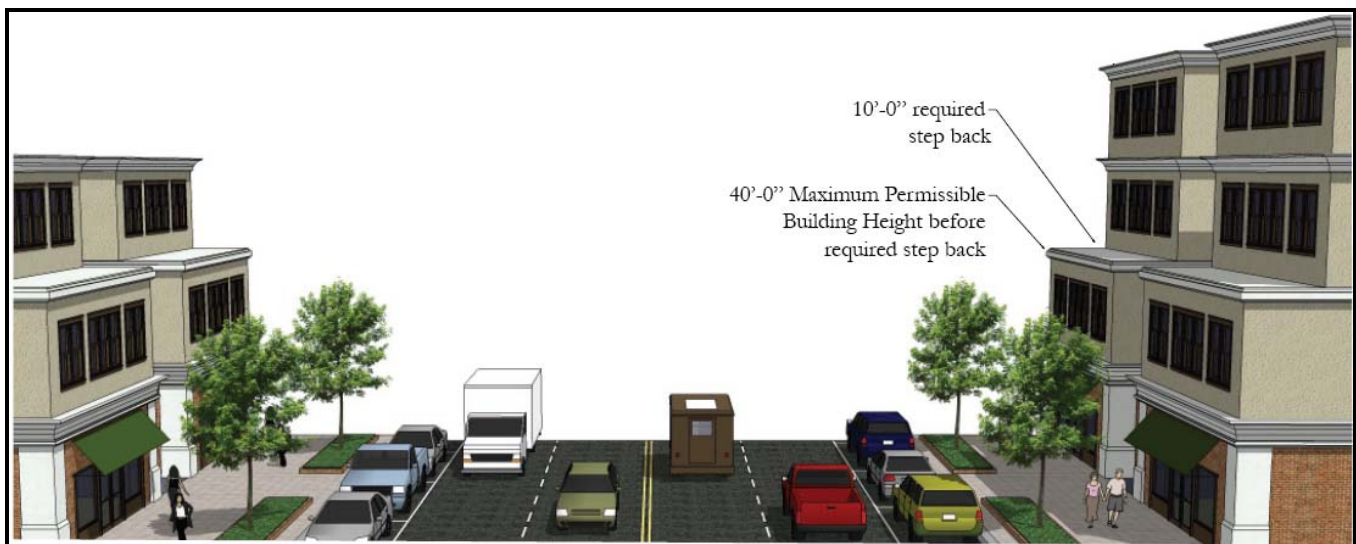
Illustrates Design Guideline 1.1.5, step backs and building heights
